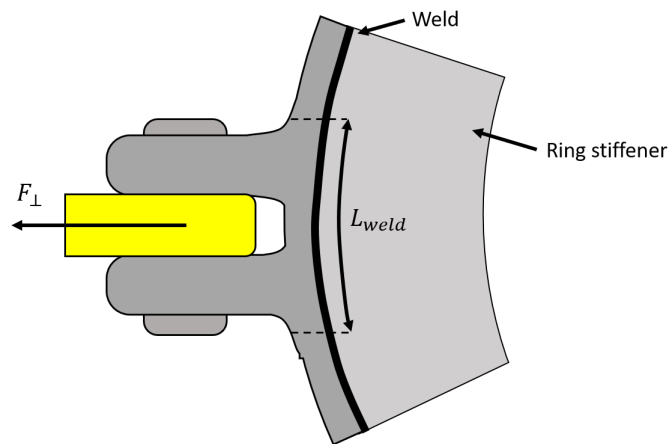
The perpendicular of the force is assumed to be transferred through only a part of the weld
